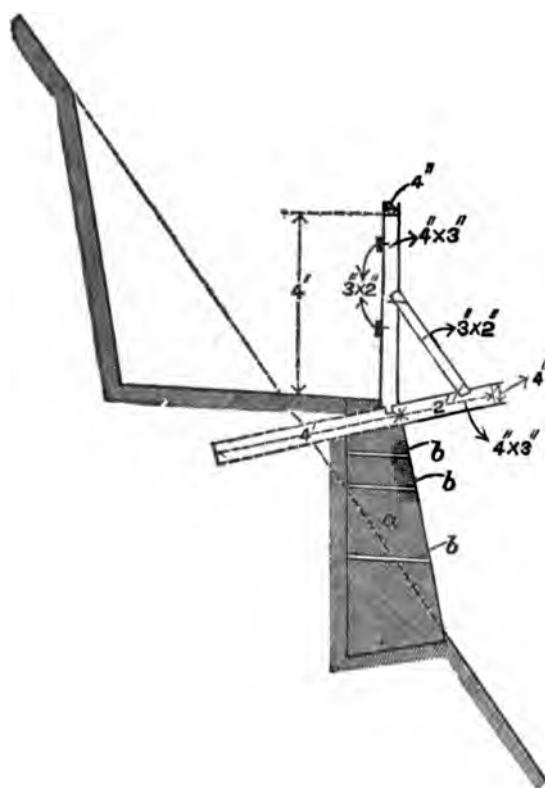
is a cross section of a bridle-path showing the construction of a retaining wall and also of a good form of wooden railing for the protection of the traffic. *a* is the retaining wall; *b, b* weep-holes in it. The dotted line shows the original surface of the ground. Scale = $\frac{1}{8}$ inch = 1 foot.
